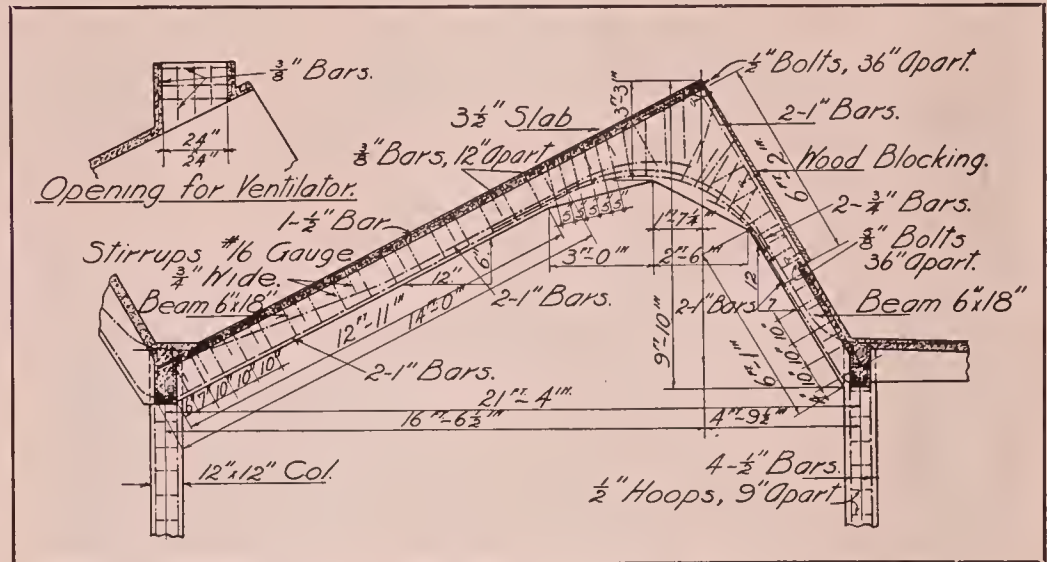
Cross Section Detail of Saw-Tooth Roof.
